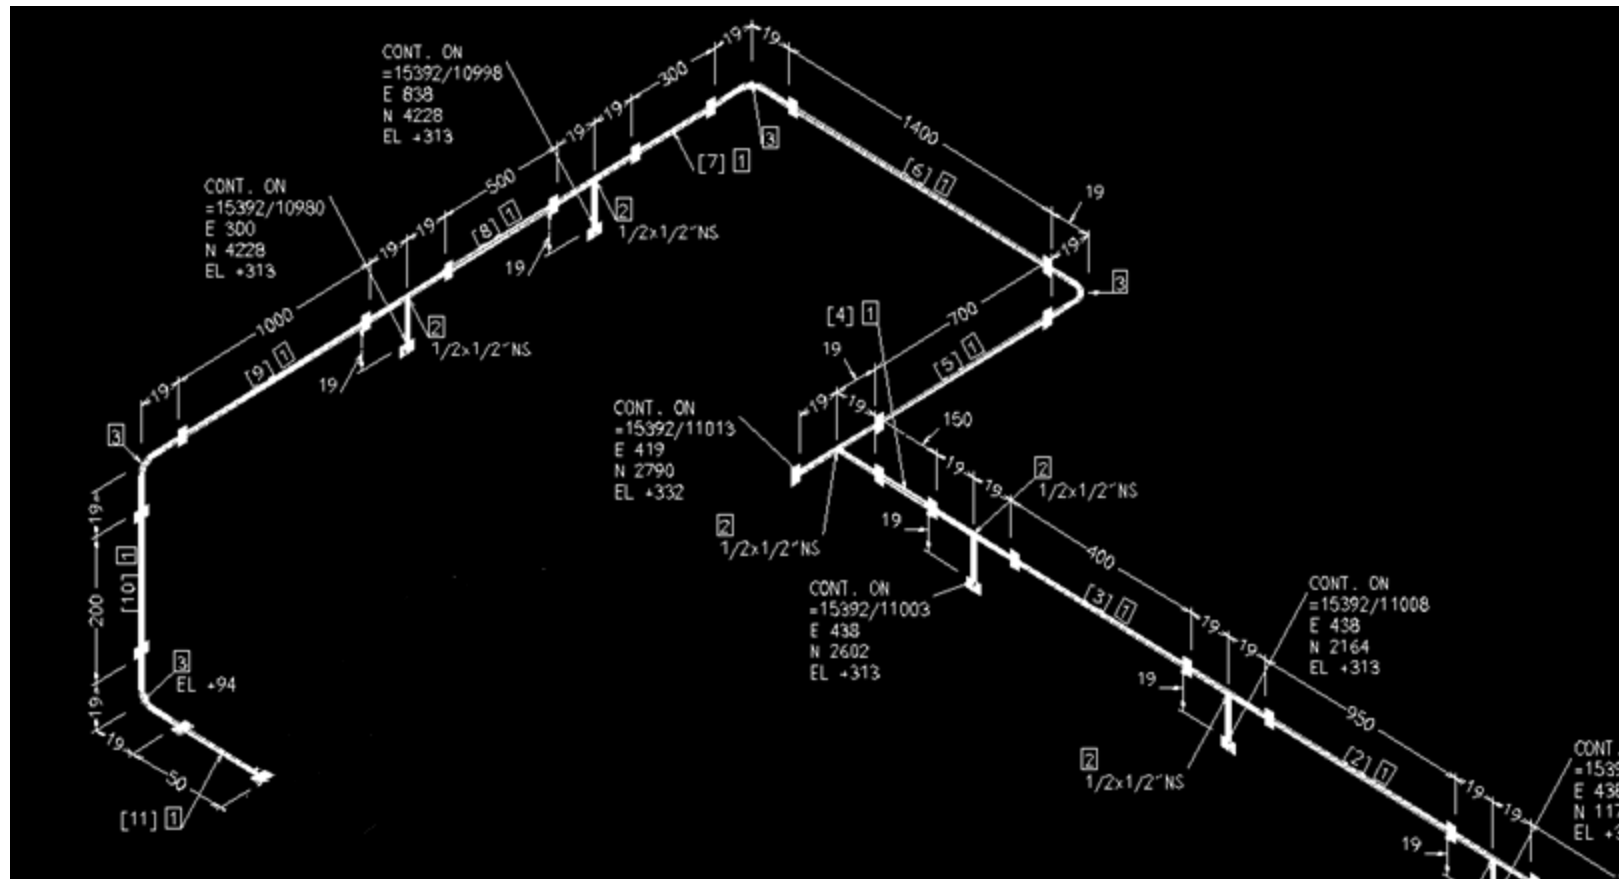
Tubing layout at Biotech Lab 2 (Isometric review)
